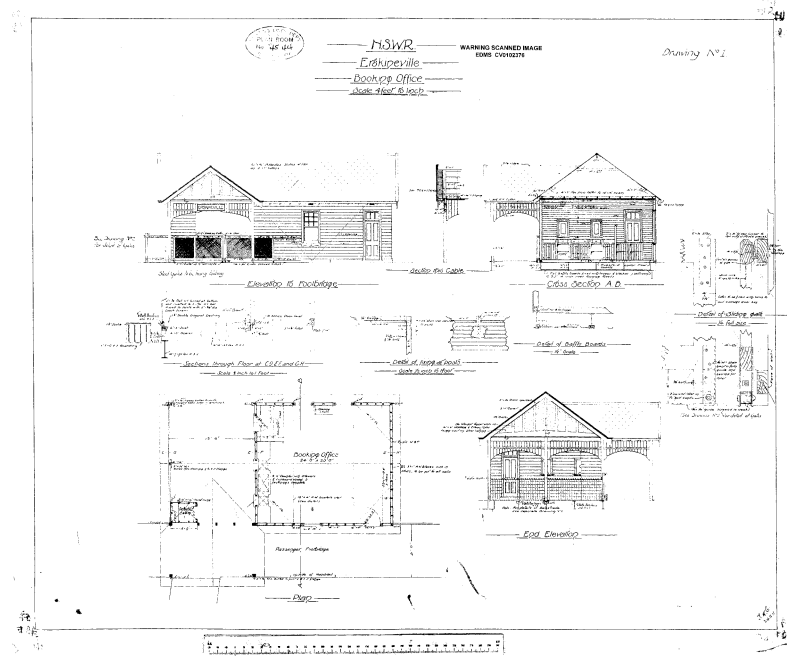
1911 plans for Erskineville Station overhead booking office
